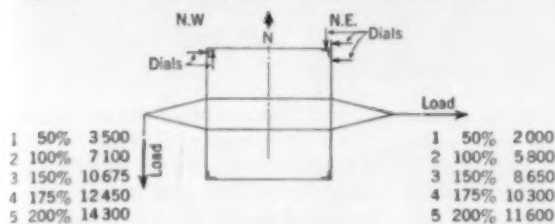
RESULTS OF ACTUAL TEST LOADS APPLIED TO A TOWER ON CONCRETE PILES
